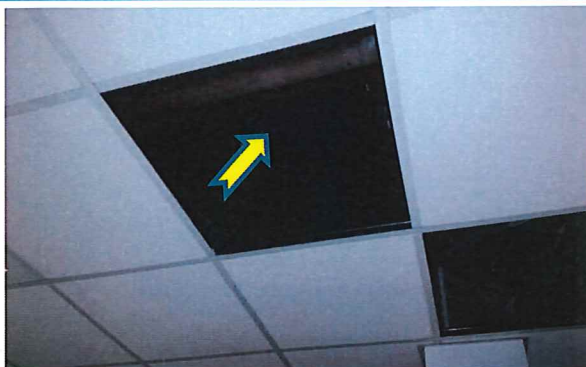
Example of suspended ceiling tile system with several tiles missing, exposing the coffer in the void above.
